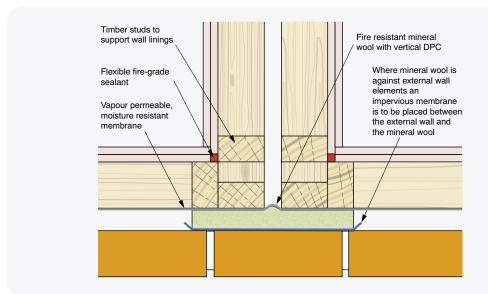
Double stud fire-protected timber internal wall intersecting a brick veneer wall.
